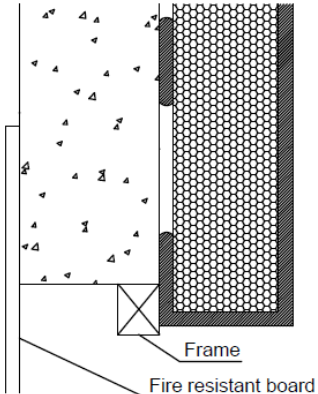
Window mounted flush with the outer edge of the wall supporting the façade system.
